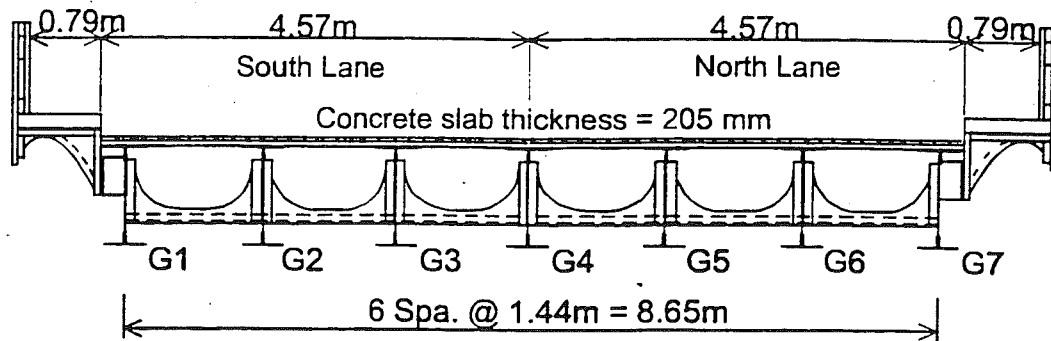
Cross Section of Bridge US223/RR (B02-46062), in Palmyra
